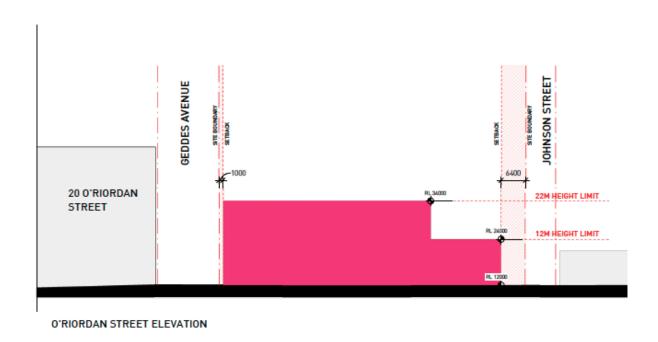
Proposed building envelope - O'Riordan Street (west) elevation
